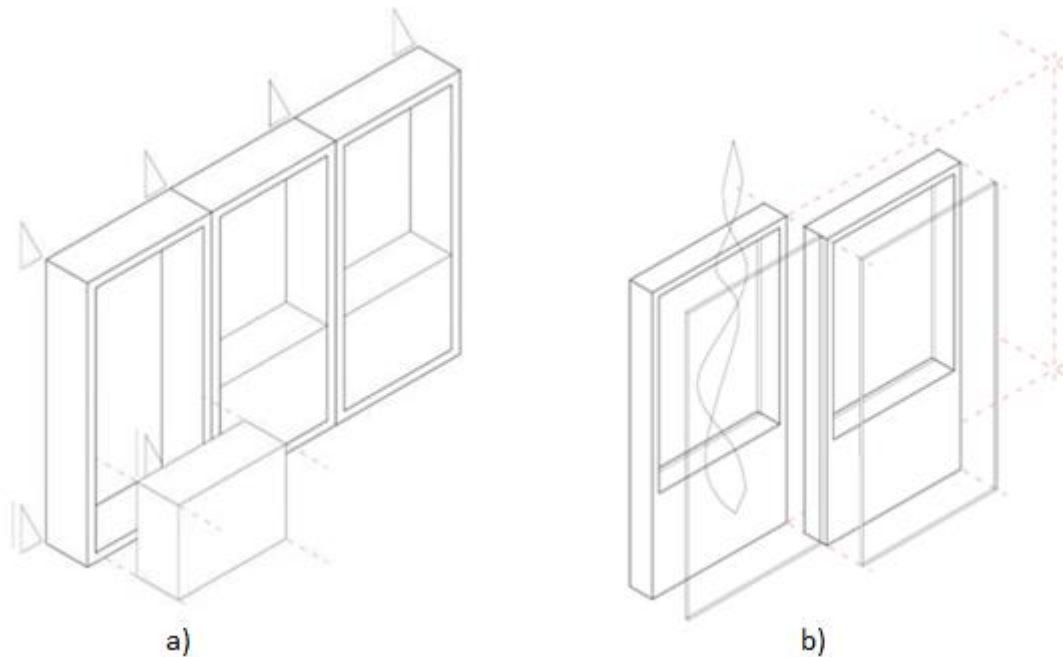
Types of façades: a) curtain wall façade and b) double façade (Knaack et al., 2007)
